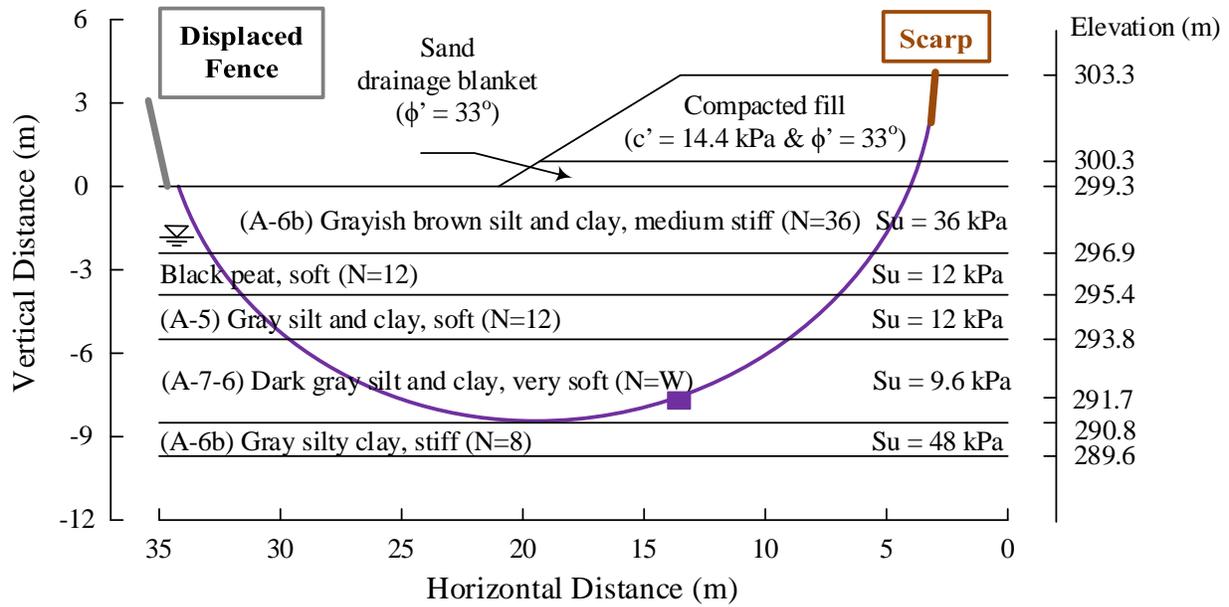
Subsurface cross-section for failed embankment, estimated undrained shear strengths, depth of movement at 12.5 m (~41 ft) in slope inclinometer at Station 200+00 (see solid block) at Elevation +291.7 m, and observed failure surface.
